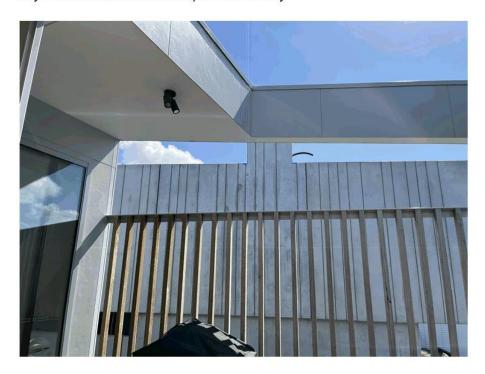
Partially constructed waterside dwelling and southern chimney at 720 Sandy Bay Road as viewed from the adjacent deck at 724 Sandy Bay Road.
